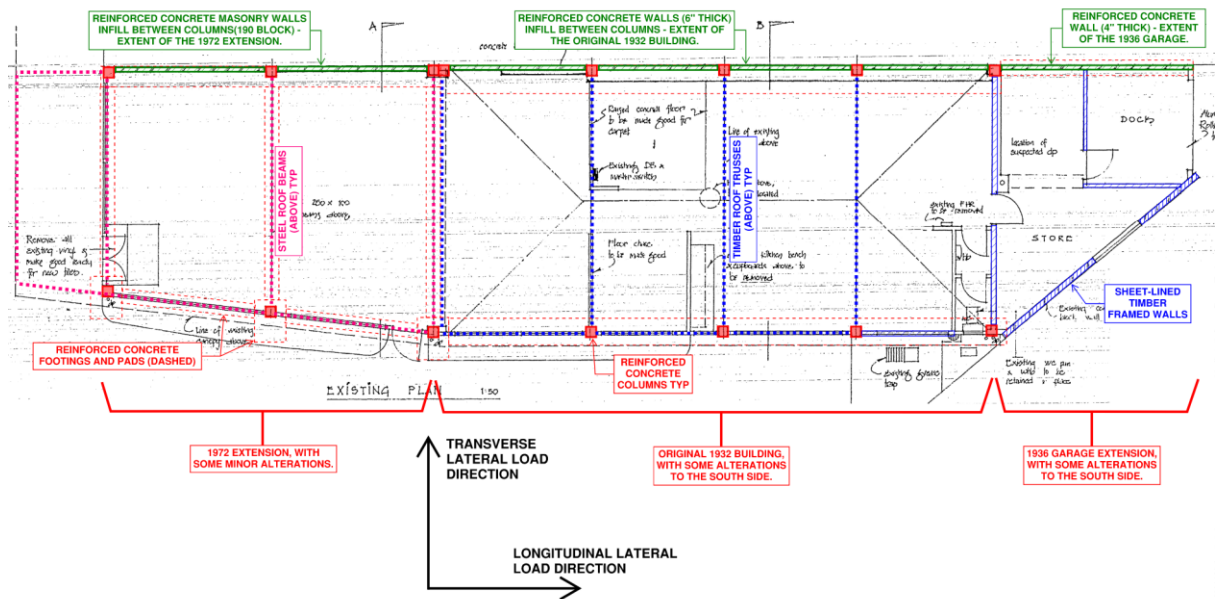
Floor plan of the building, showing the various parts added over time.
